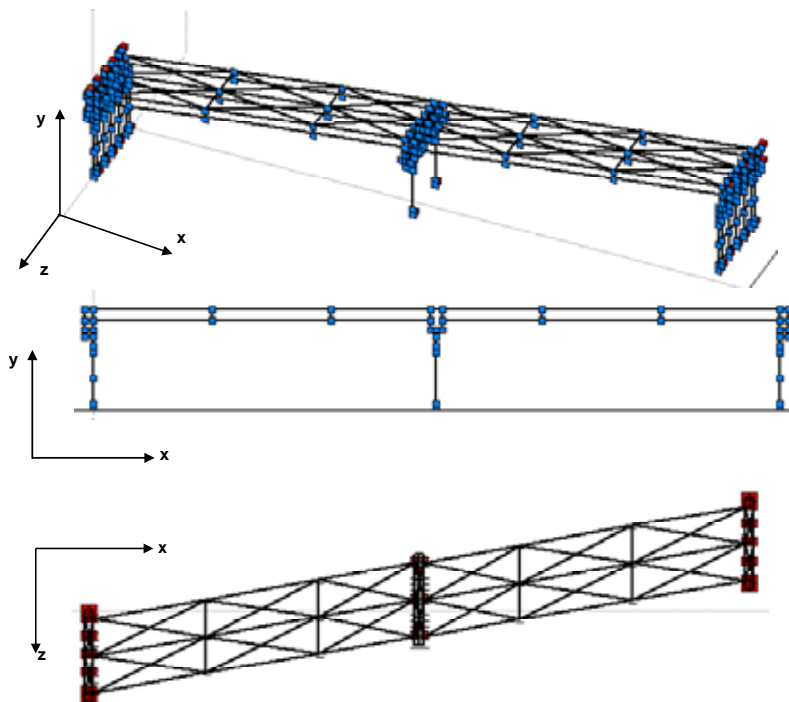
Numerical model of Las Mercedes Bridge, *Top*: overview, *Middle*: elevation, and *Bottom*: plan
